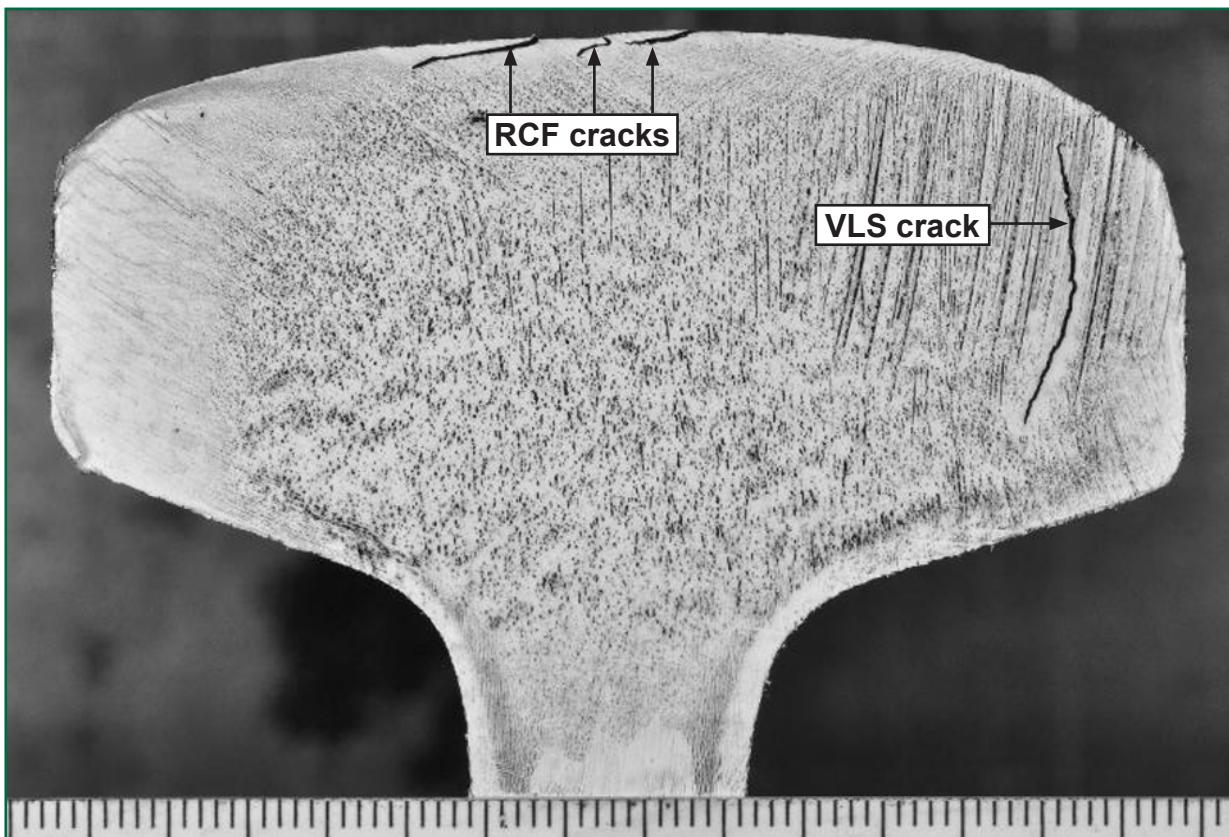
Magnetic particle inspection of the rail cross section at the start of the VLS section (image courtesy of Serco Rail Technical Services)
